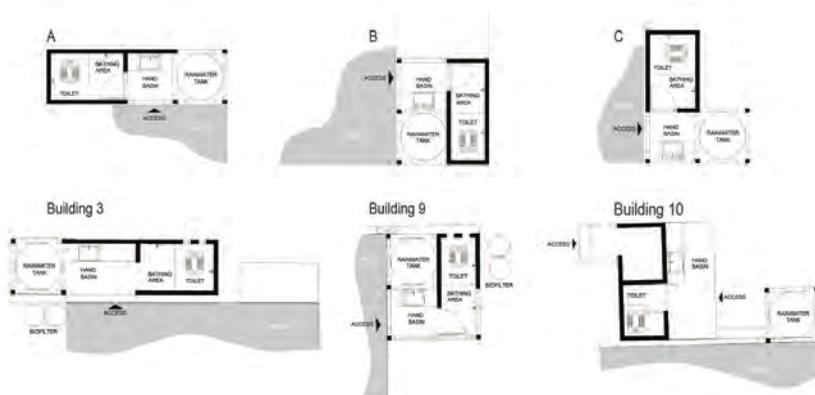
A, B and C demonstrate the original wetpod types and the plans for buildings 3, 9 and 10 illustrate how the wetpods were adapted to address the existing configuration and household requirements.
